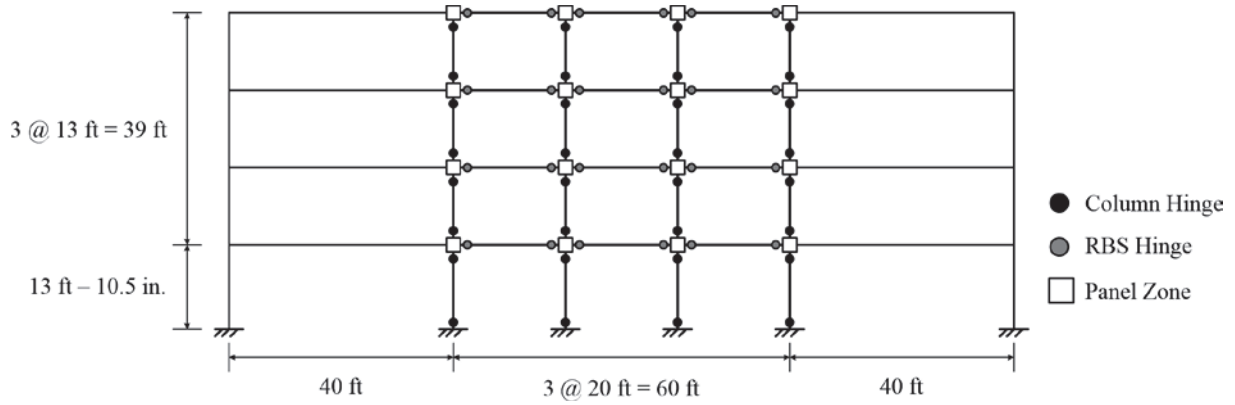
Four-Story Steel Moment Resisting Frame E-W Elevation
